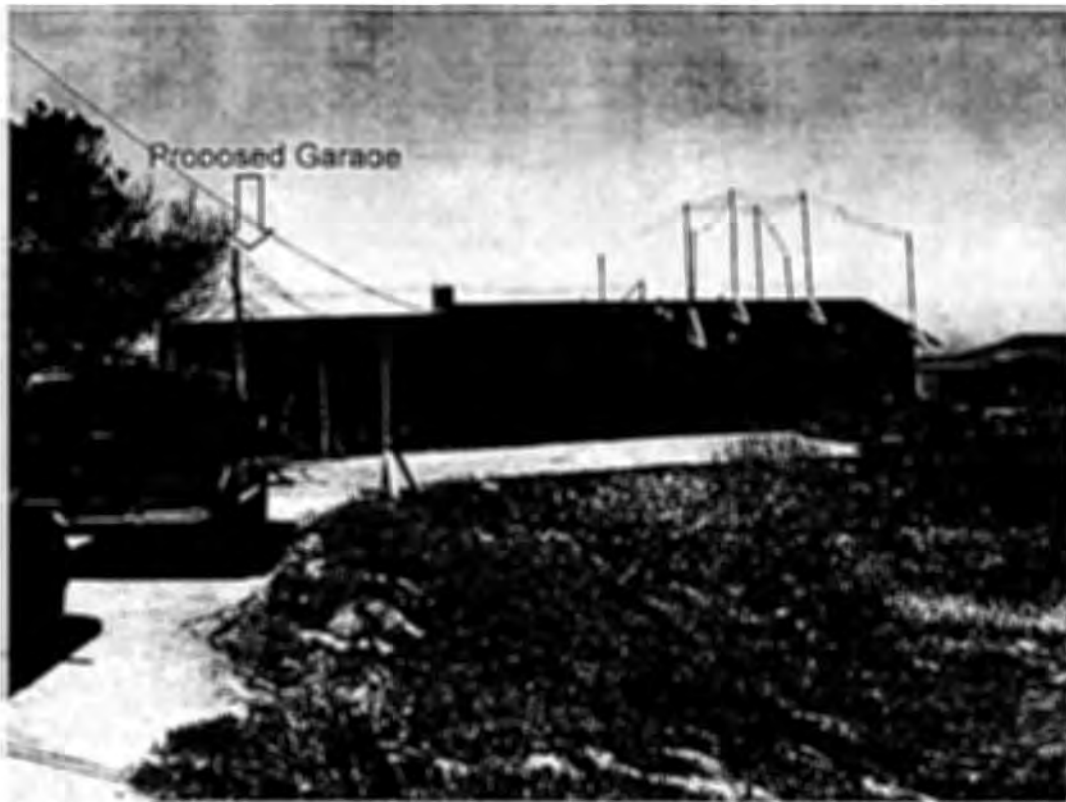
View of existing and proposed house and garage from Pico Blvd.
